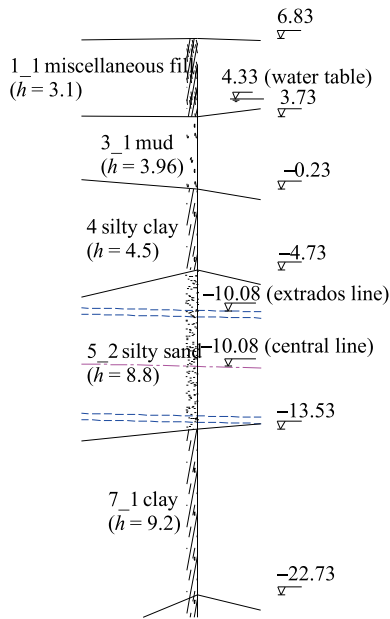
Ground condition revealed from boring hole at the stake XK17 + 100 (unit: m).
